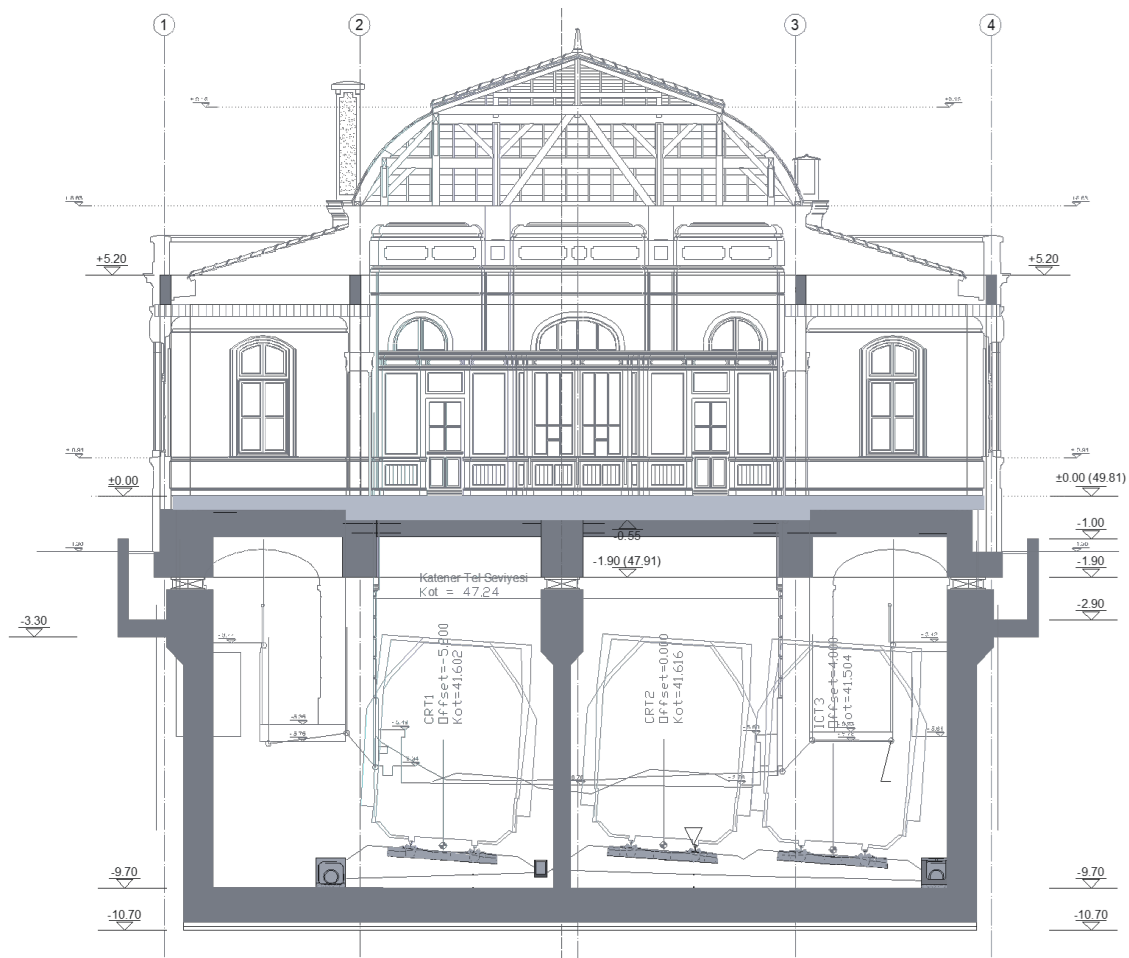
The targeted state of the structure after strengthening (Elevation from Gebze direction).
